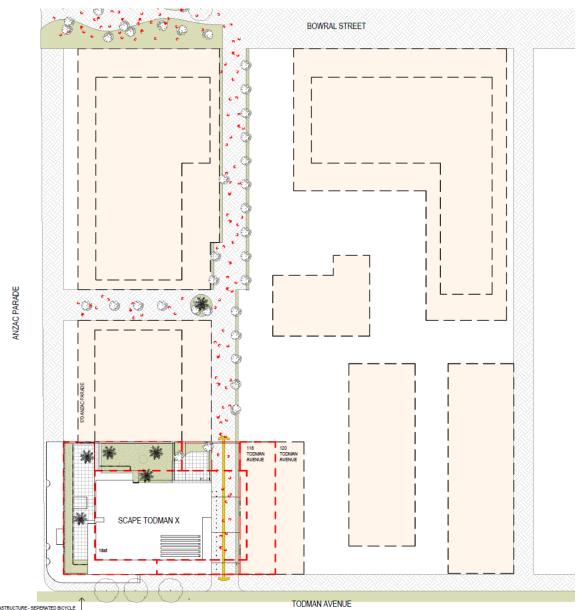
Site plan showing approved development including a through site link (brown arrow) to connect to Bowral Street Plaza in future (Source: BVN Architect)
